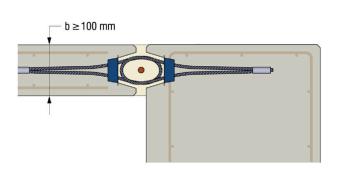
Wall - Wall - CORNER CONNECTION - standard detail
